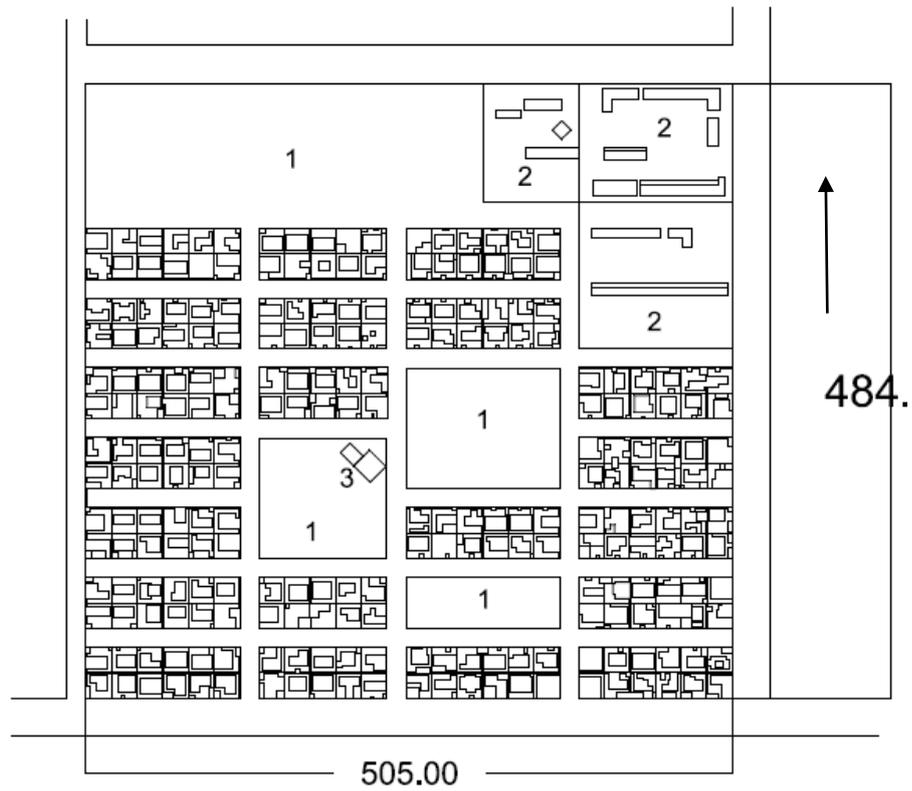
Plan for third model (all houses with four storey, 13m). [Author]
